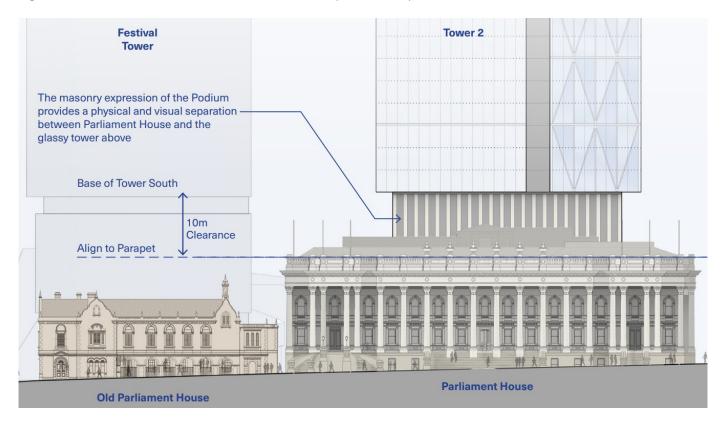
Tower 2 & Parliament House Southern Elevations (Source: JPW)
